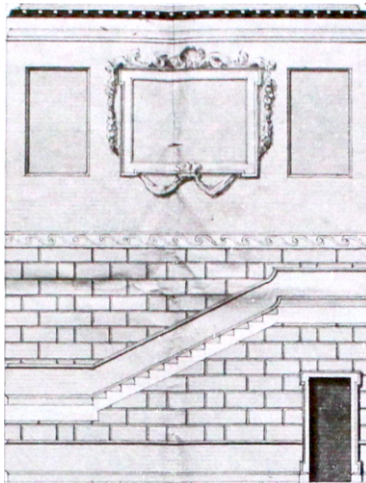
Drawing of the staircase of the Old Library, Trinity College Dublin.
